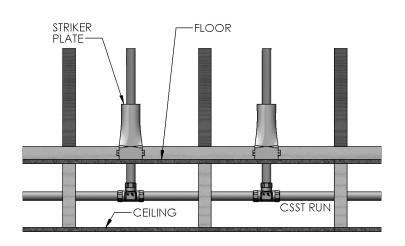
Multiple gas outlets connected to the same run of WARDFlex®/ WARDFlex®MAX. In this situation a tee-type fitting can be used and installed in a concealed location.
